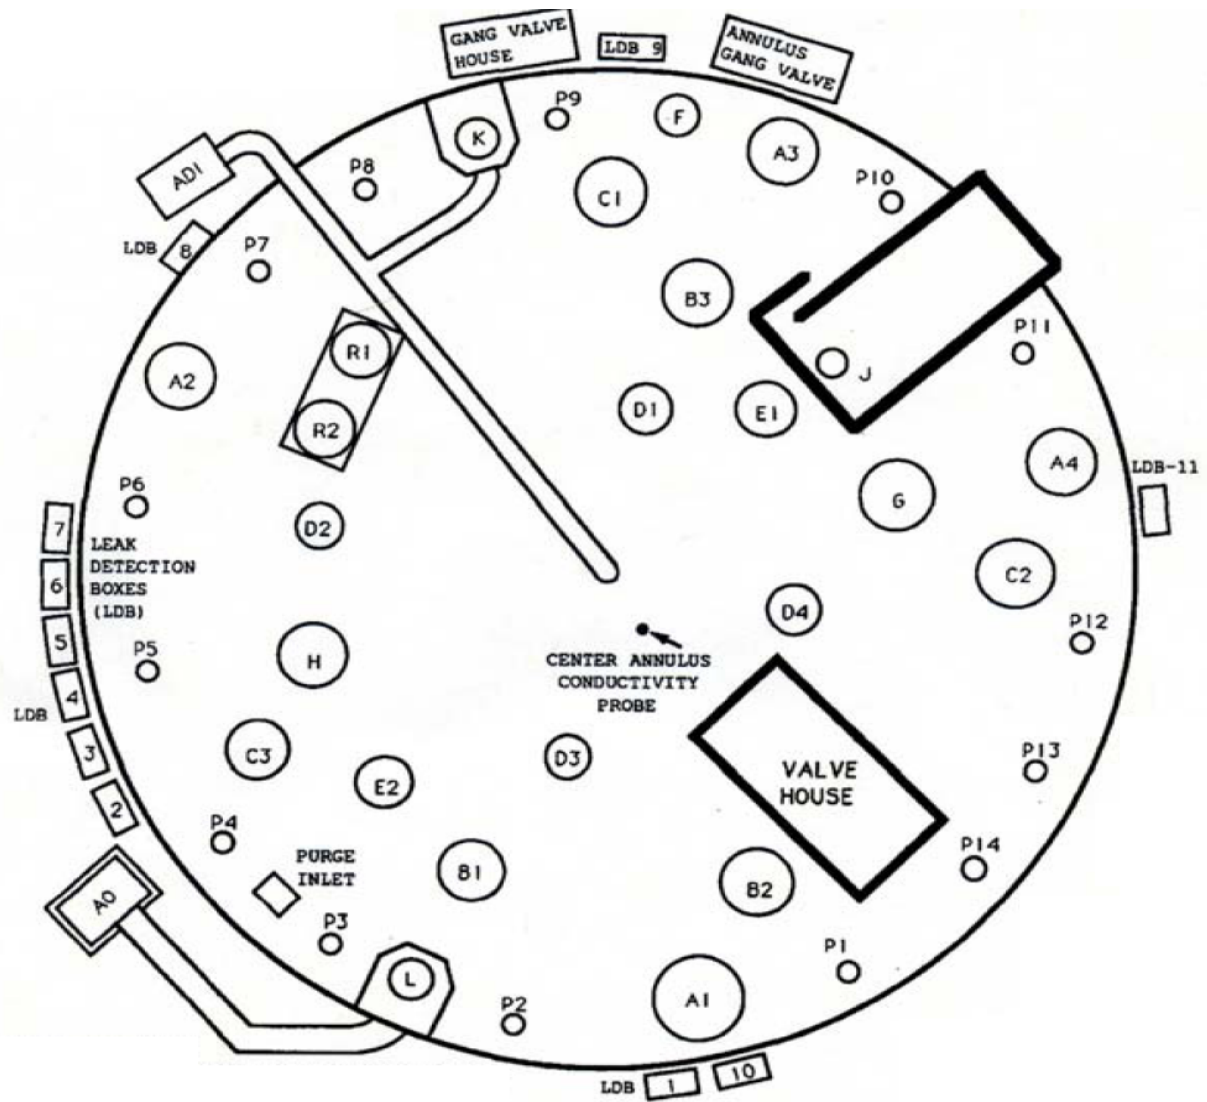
Typical Type III/IIIA Waste Tank Riser Layout – Tank 26
